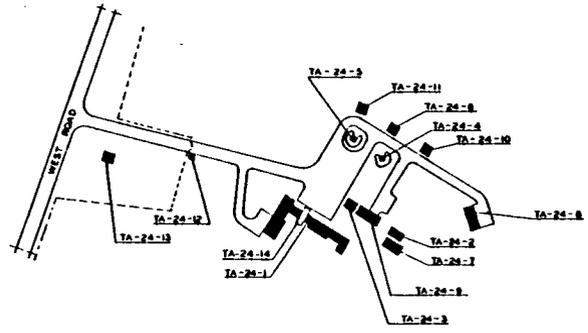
Structure Location Plan for TA-24 - T Site
